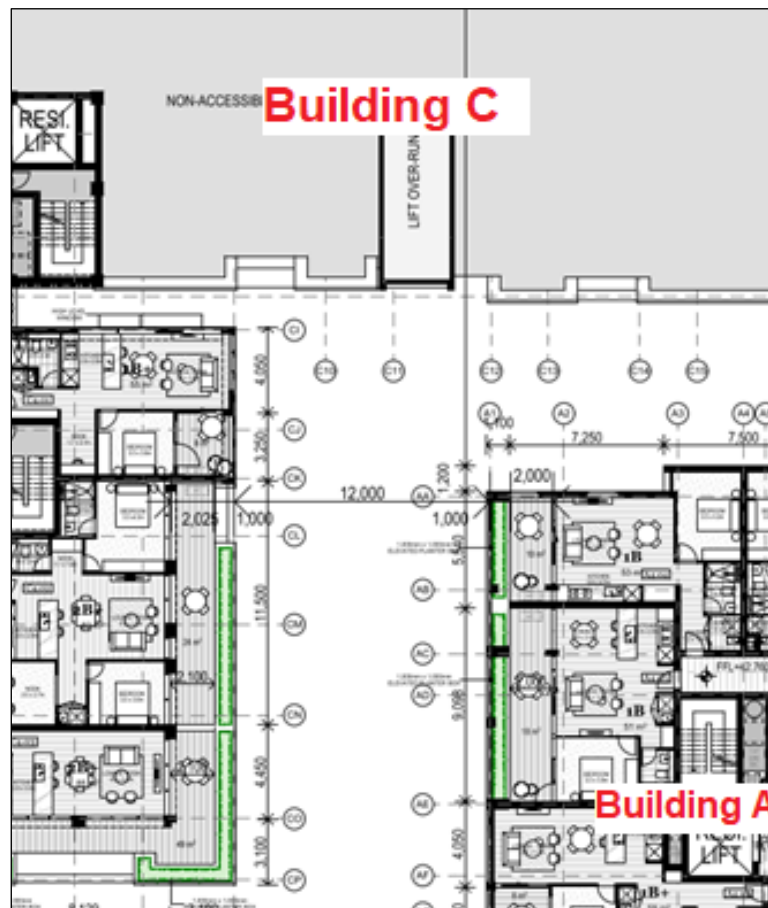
Building separation at level 4 (5th storey) – 18m required.
